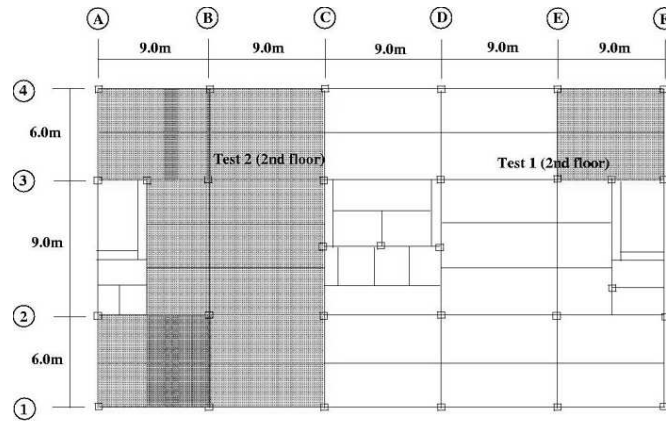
Plan of Cardington test building showing location of the BRE fire tests [?]
